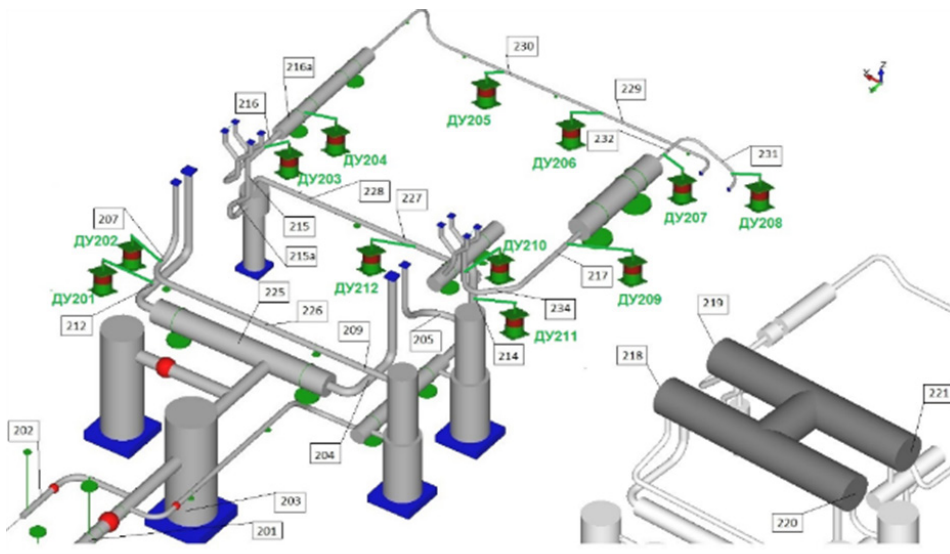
Scheme of dampers installation on interstage piping of compressor No 2.
